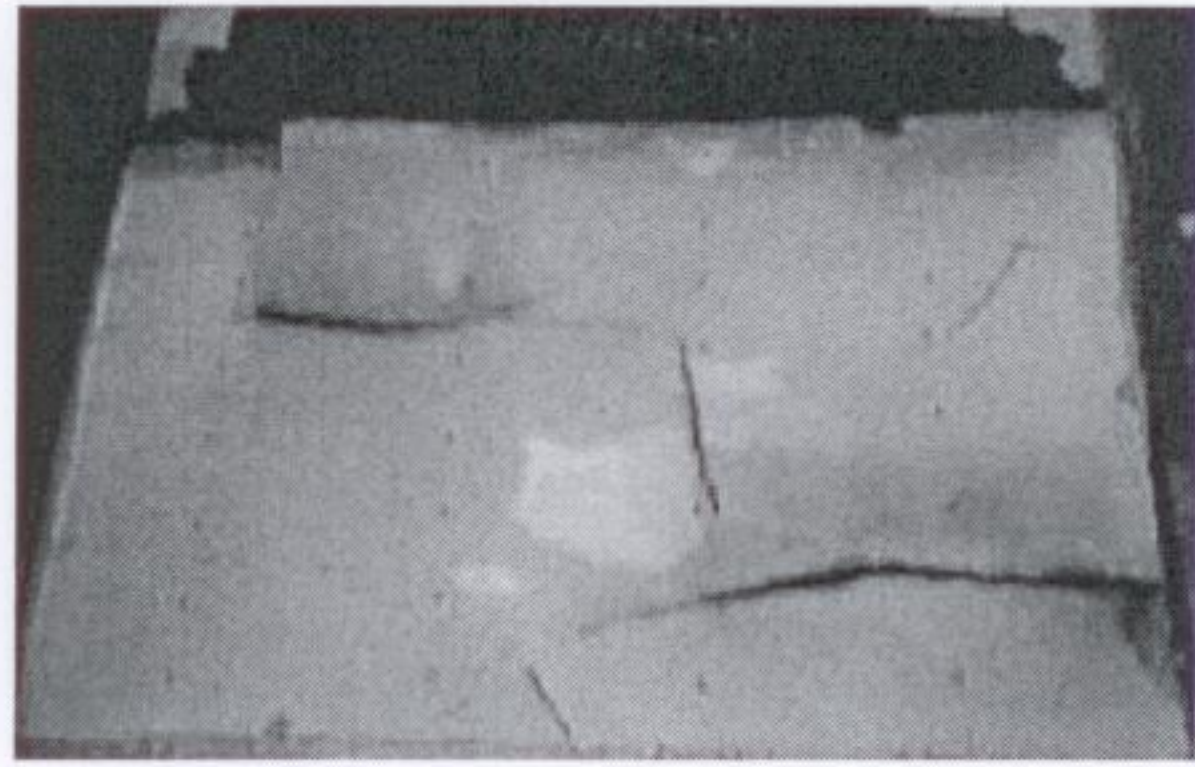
Gypsum wallboard protection for deck — after fire exposure.
